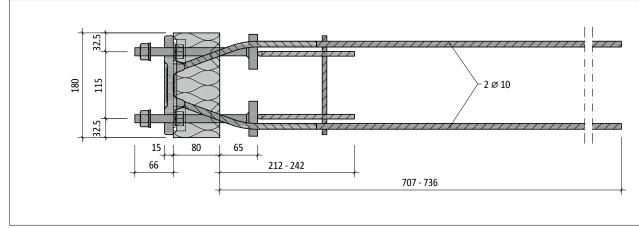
Schöck Isokorb® T type SQ-V2: Plan view
